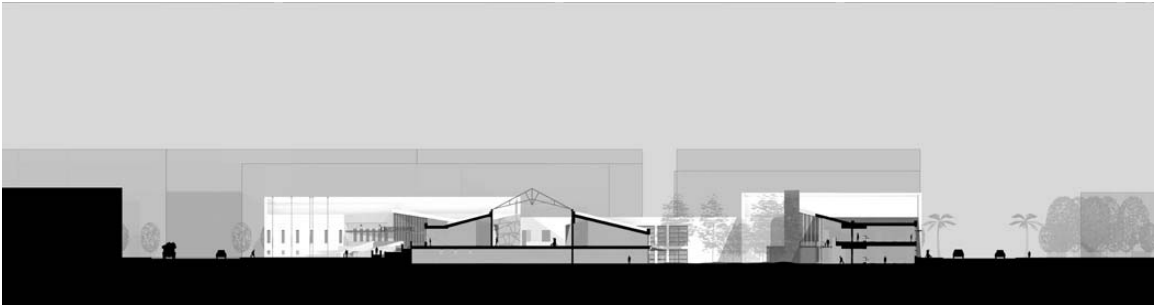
Site Section Facing North in Proposed New School of Orlando Campus
